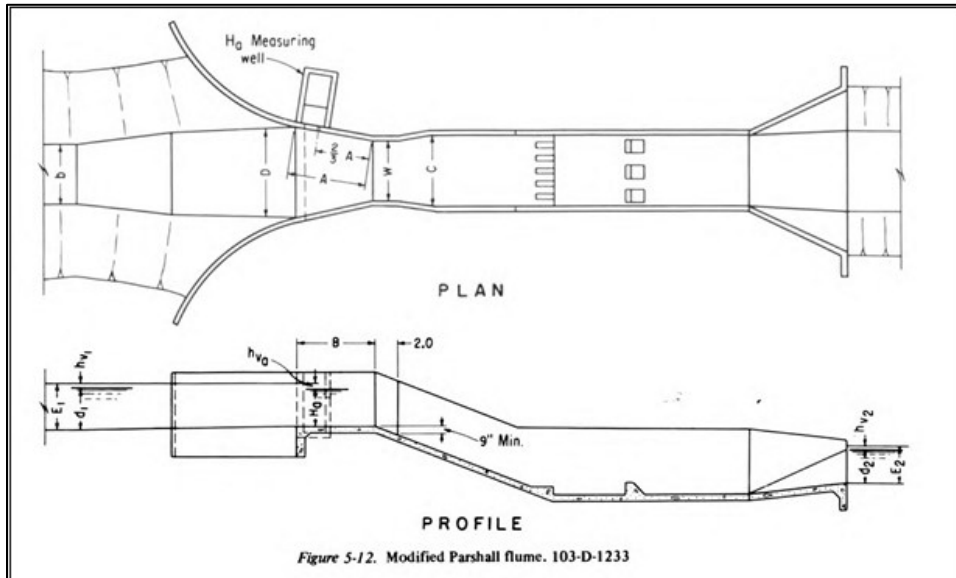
A schematic drawing of a concrete modified Parshall flume.²⁹⁴
